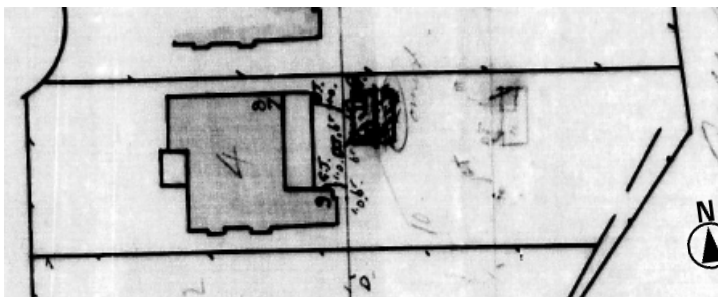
Drainage plan dated November 1926, showing a footprint of the house at 4 Astolat Avenue (Lot 8) (Source: SEW, Drainage Plan No. 154800)
